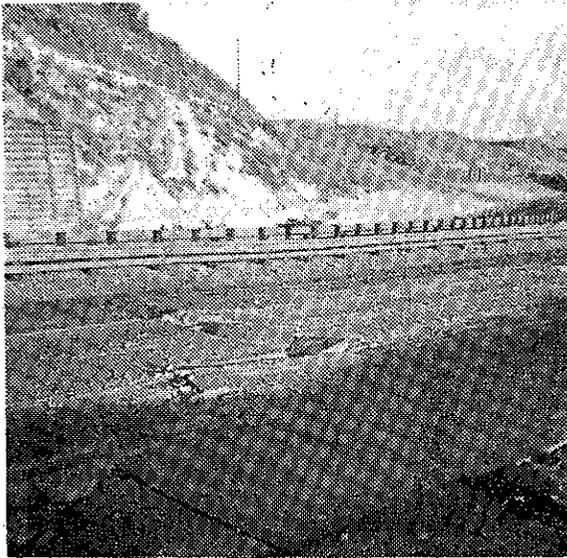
Looking easterly at pavement damage on Route 5 north of Balboa Boulevard.
